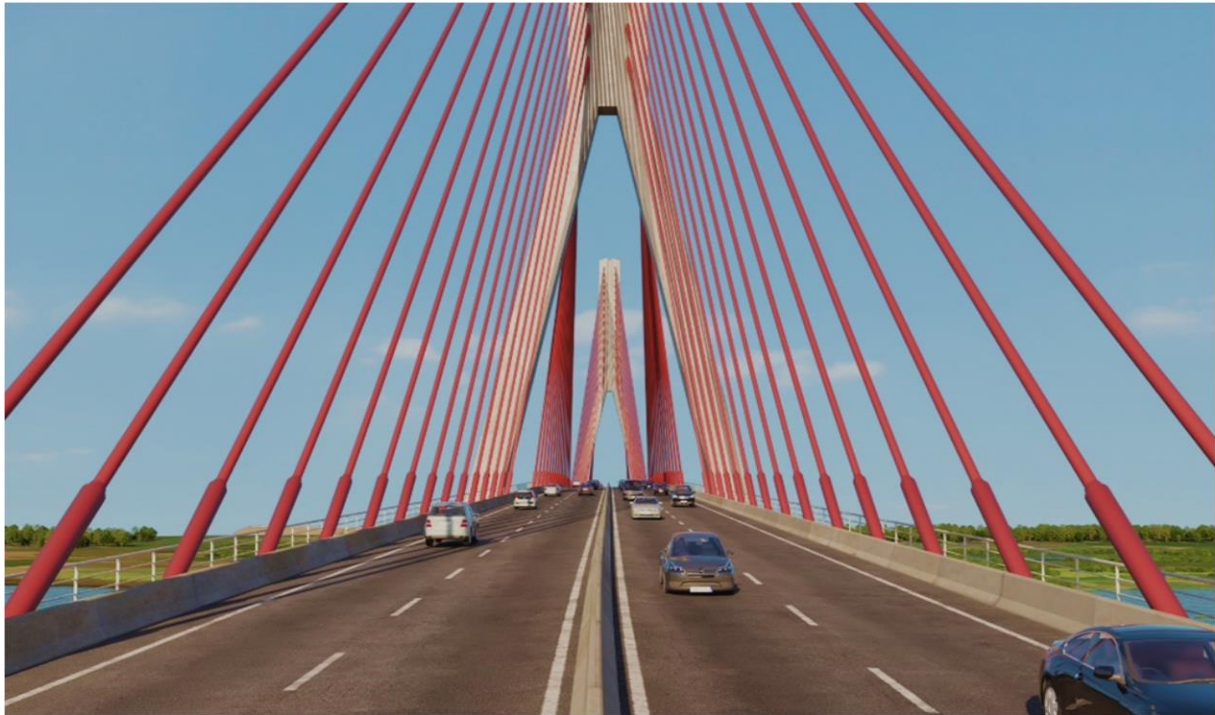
Cable Stayed bridge at Matlab Uttar-Gazaria. Road view
